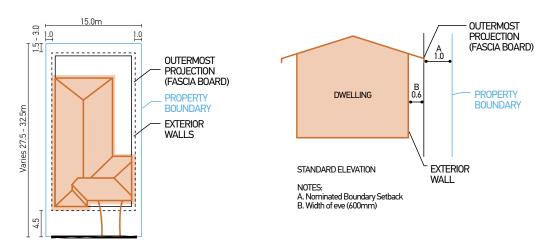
Economy Traditional Allotment - Typical Building Envelope and Setback Plan
